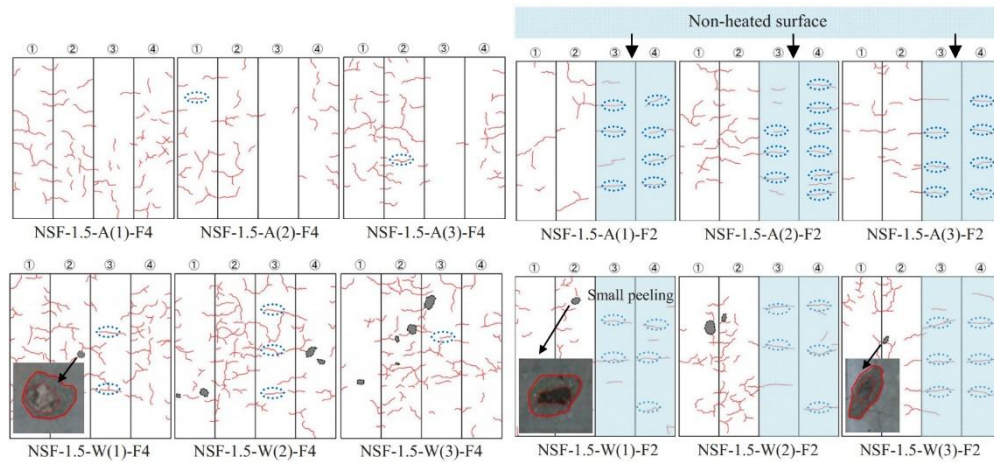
Planner figure of specimens with fibre after heating test [22]
